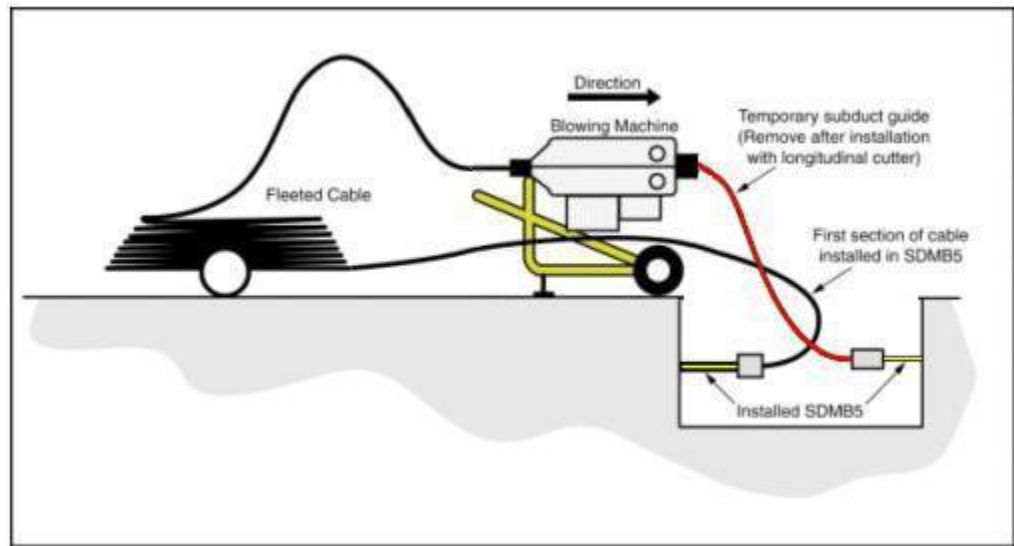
Schematic diagram showing correct layout of plant and equipment to install section of cable for mid point installation
